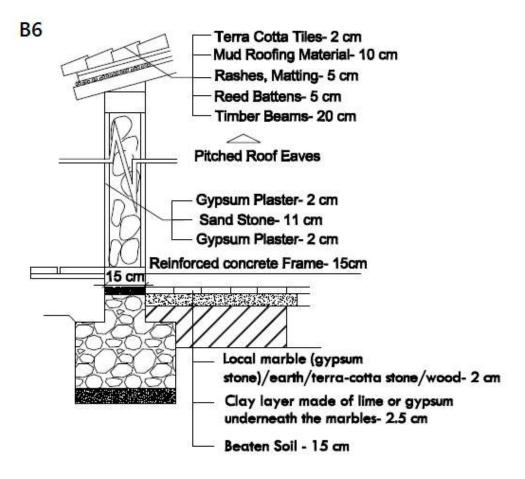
Construction Technique in British period- Stone walls and Concrete Structure- B6
